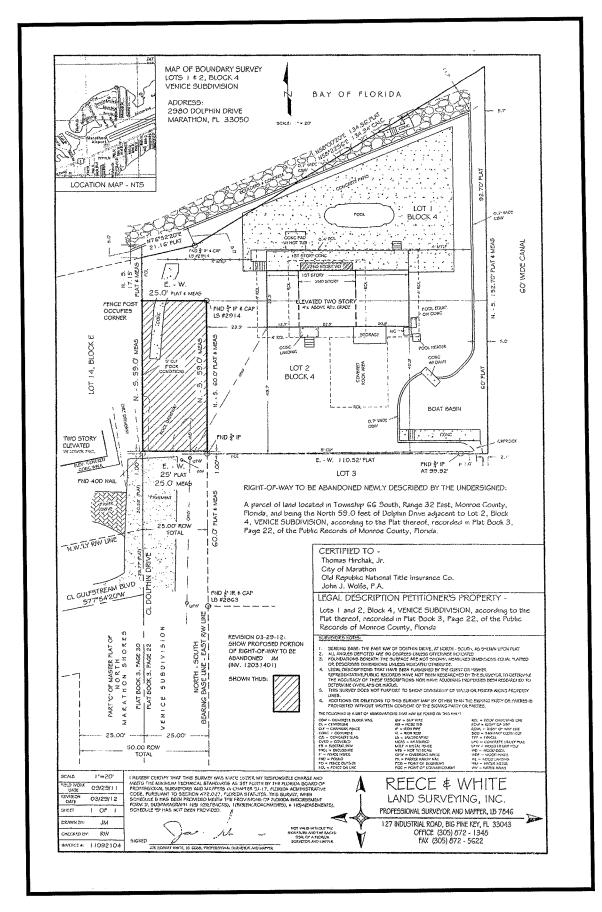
Exhibit B Copy – Original to be Provided by Applicant to Clerk of Court for Recordation
